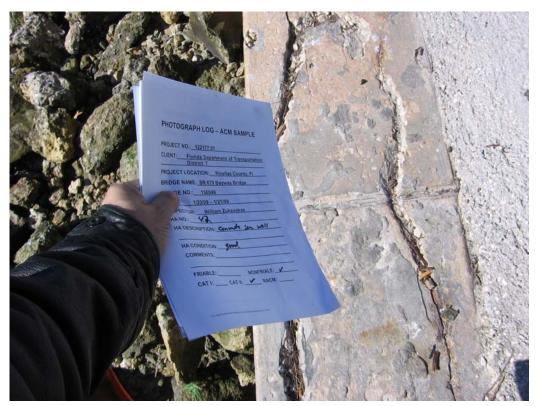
01/21/09 - SAMPLE 4.2 - HA 4 CONCRETE SEAWALL
